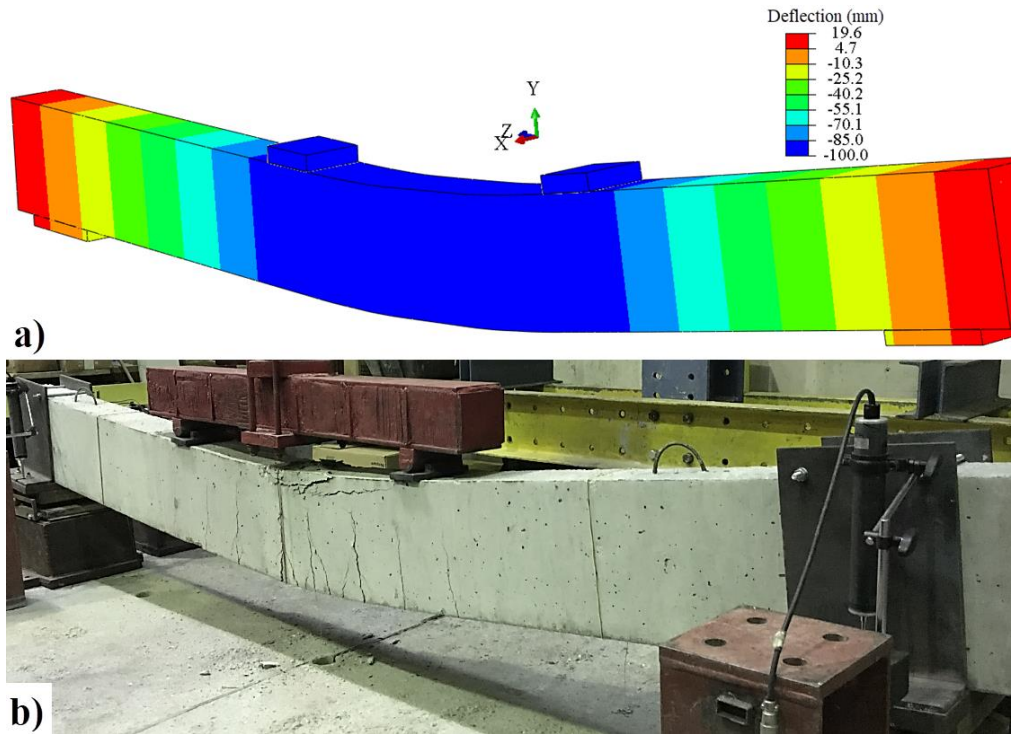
(a) Numerical (b) and experimental deformed shape for the unstrengthened RC beam (specimen RC_AT) at the failure instant: view 1
